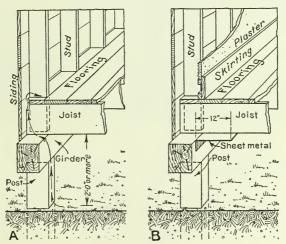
A, Typical construction of frame building on wooden girders and posts with joists more than 2 feet above ground; B, sheet metal placed as shown serves to prevent the rats from climbing to a point where they can gnaw through the wood
